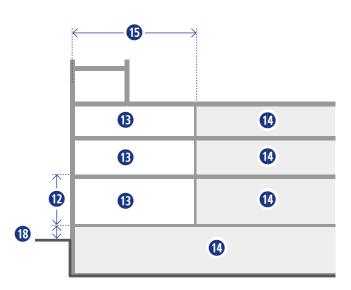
Civic Building: Floor-to-Floor Height & Use Requirements
